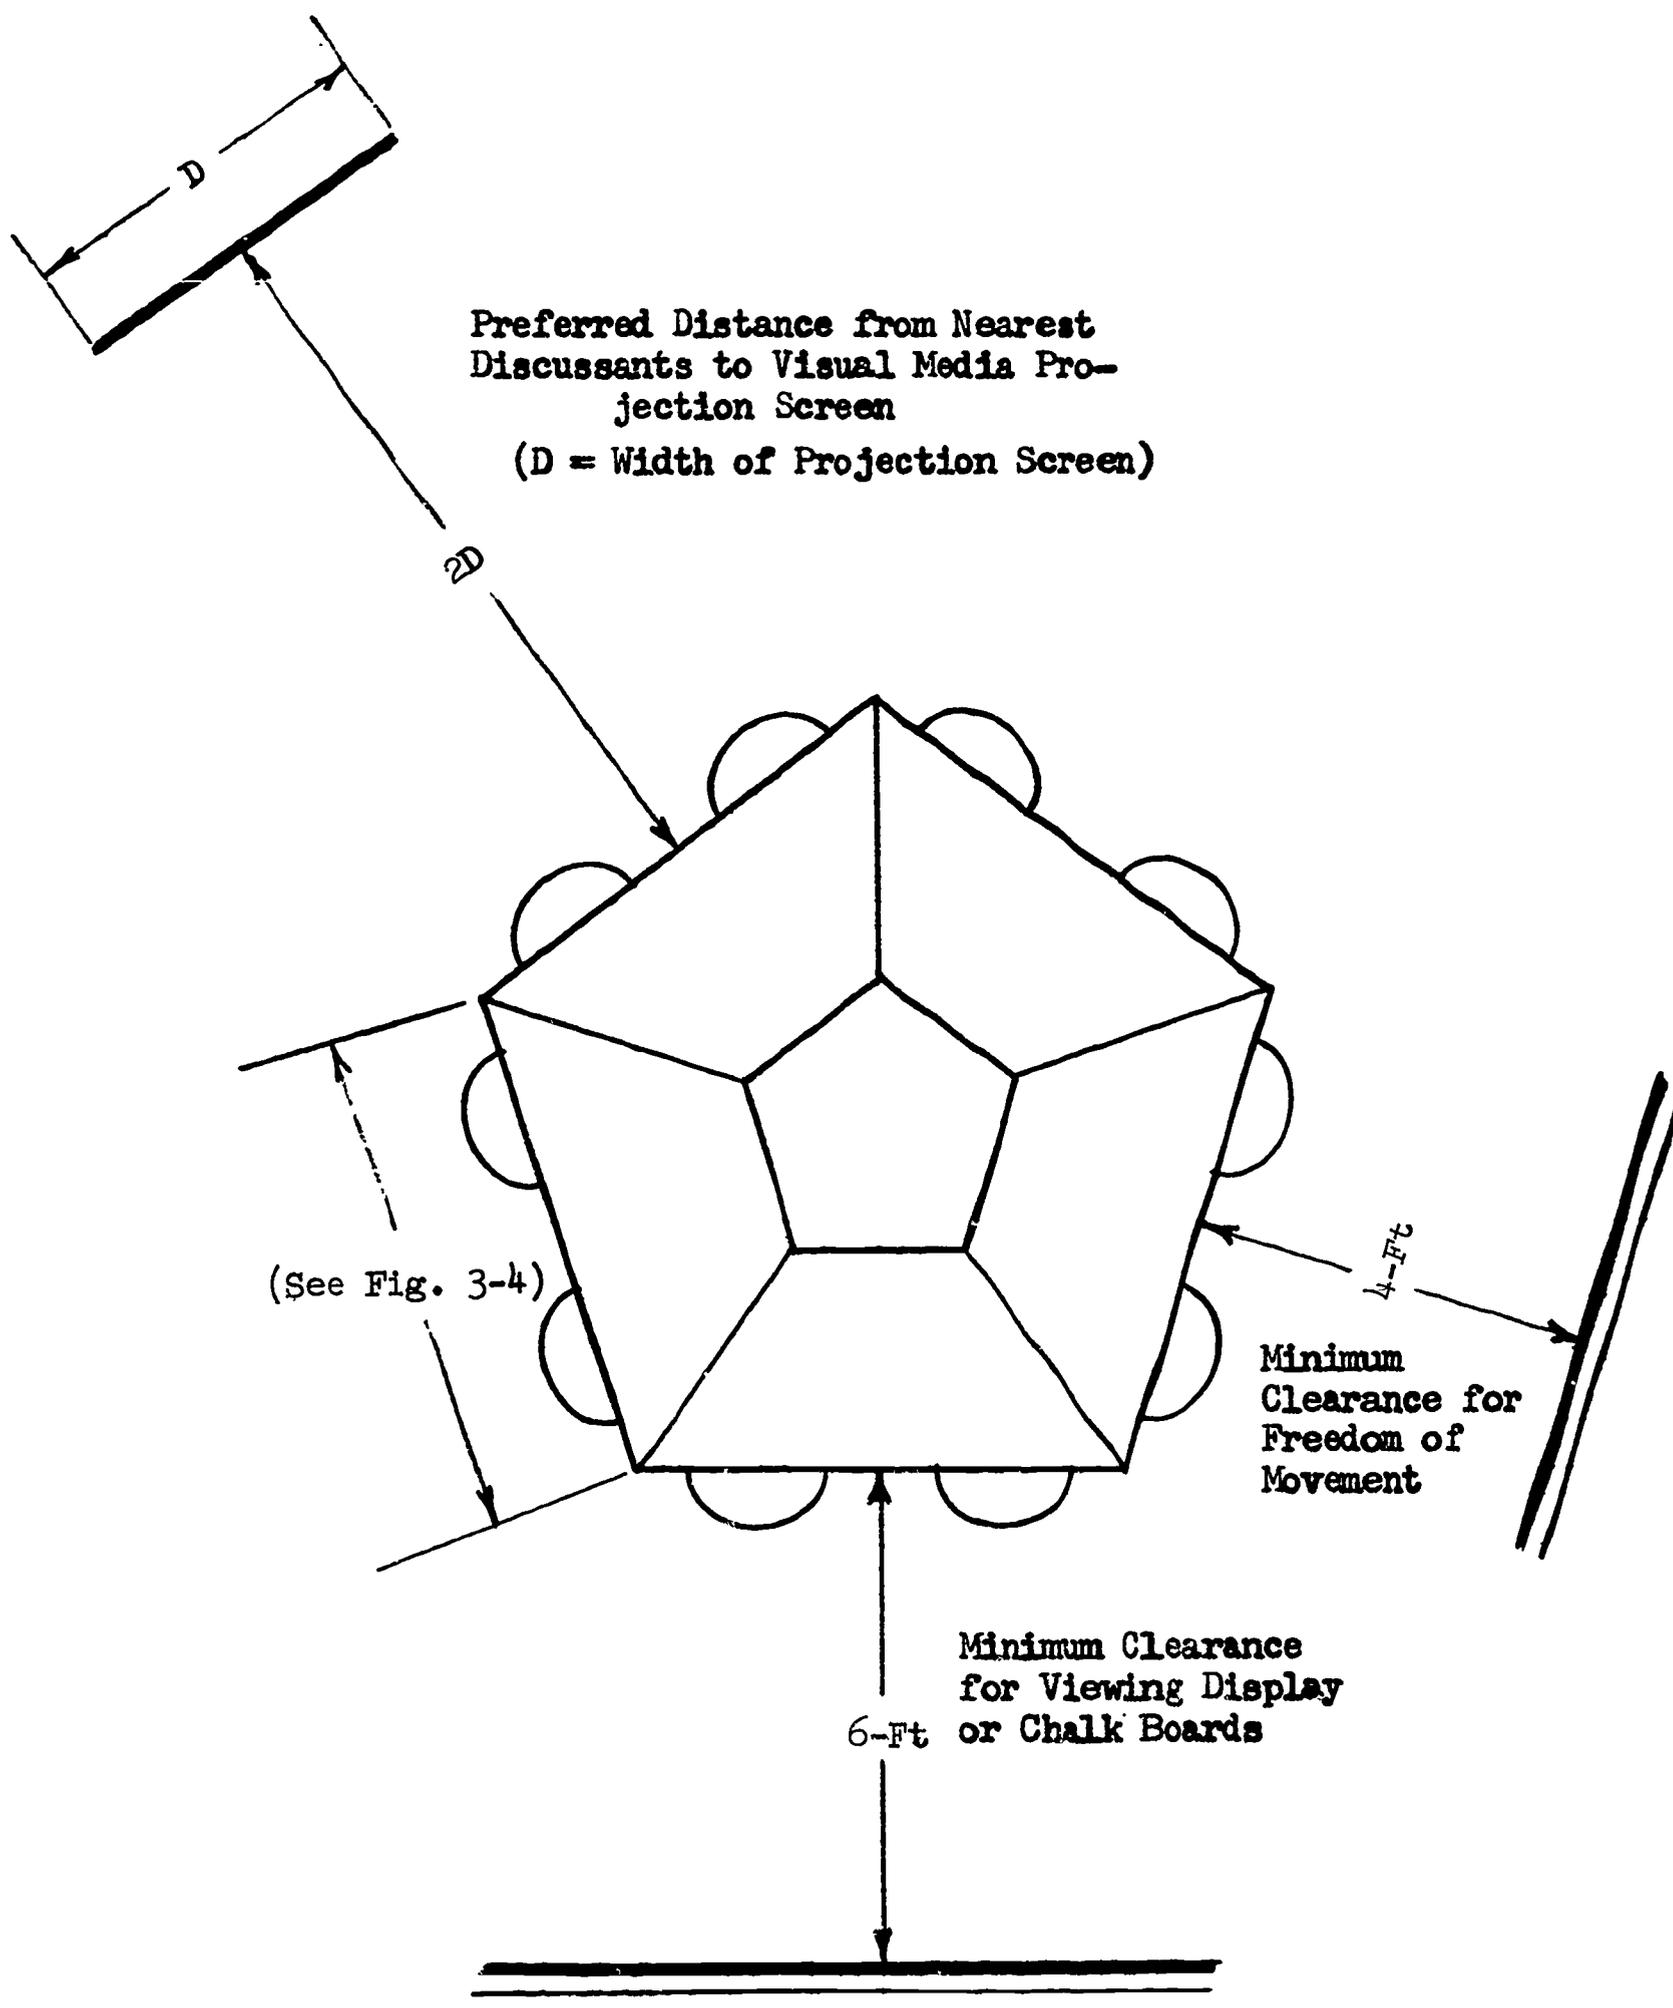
Preferred Clearance Dimensions for Room Layouts
